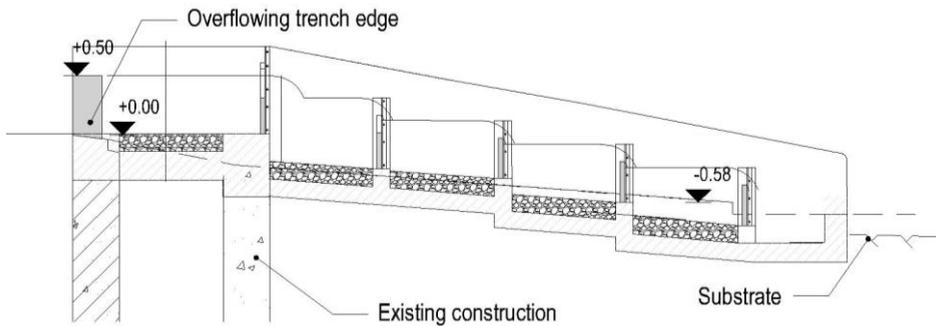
Pool pass with surface notches at the walls between the pools – longitudinal section
